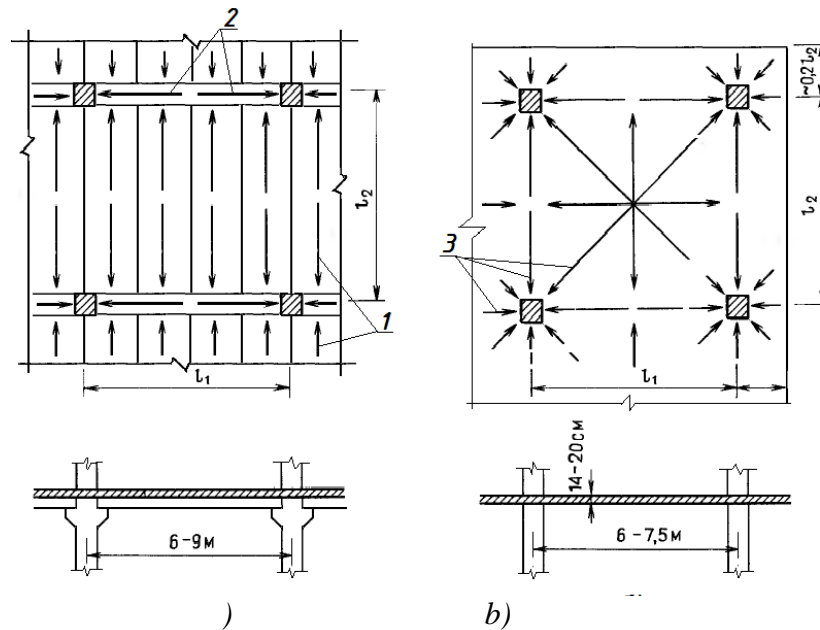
Diagrams of collecting loads on the columns: a – in the beam structural systems; b – in the flat slab frames; 1 – line of the load transfer from precast panels; 2 – line of the load transfer from precast cross-beams to the columns; 3 – lines of the load transfer in flat slab floors to columns of the frame
